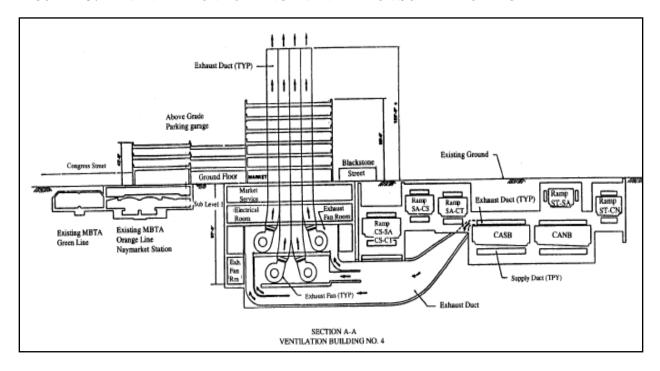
VENTILATION BUILDING 4 VENTILATION SCHEMATIC DIAGRAM
